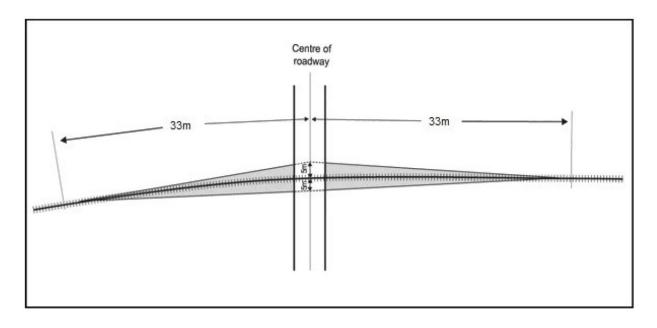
Restart sight triangles for public road/rail siding level crossings.
